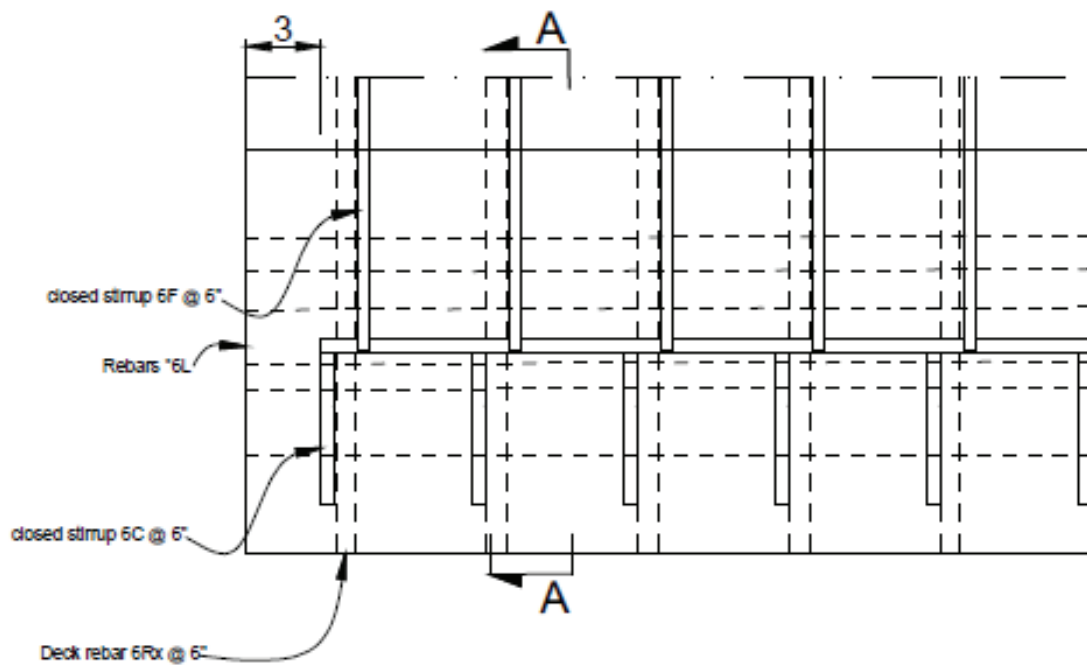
plan view of the Traffic barrier 36" single slope with close rectangular GFRP stirrups, all measurements in inches (1 in = 25.4 mm)
